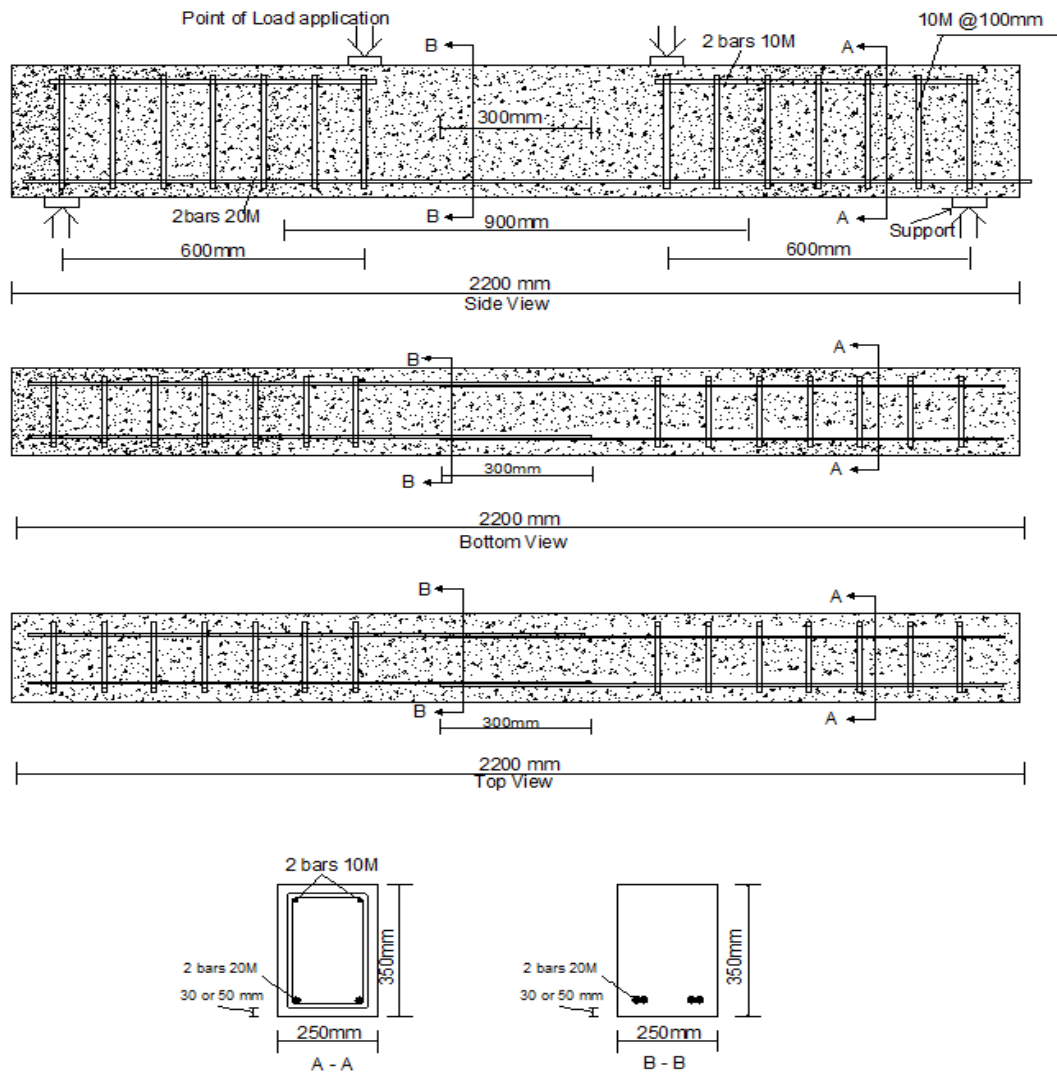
Beam cross-section and reinforcement layout along the span for Group 2 and Group 3
